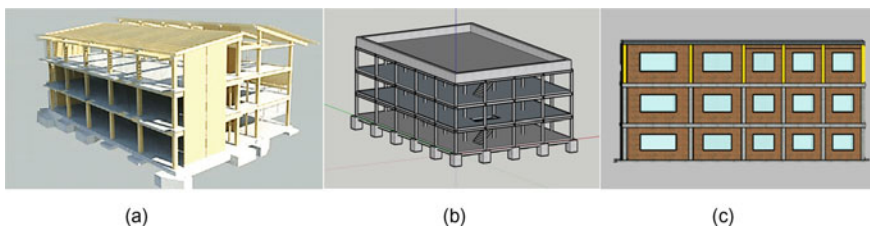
Three-story building design in timber, concrete, and masonry [6]
